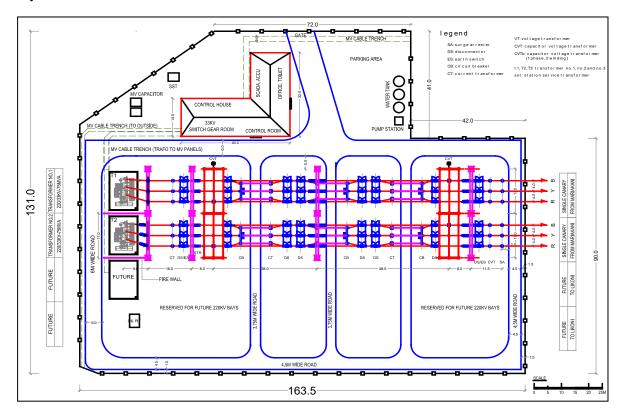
Layout of Mombasa SEZ 220/33 kV substation
